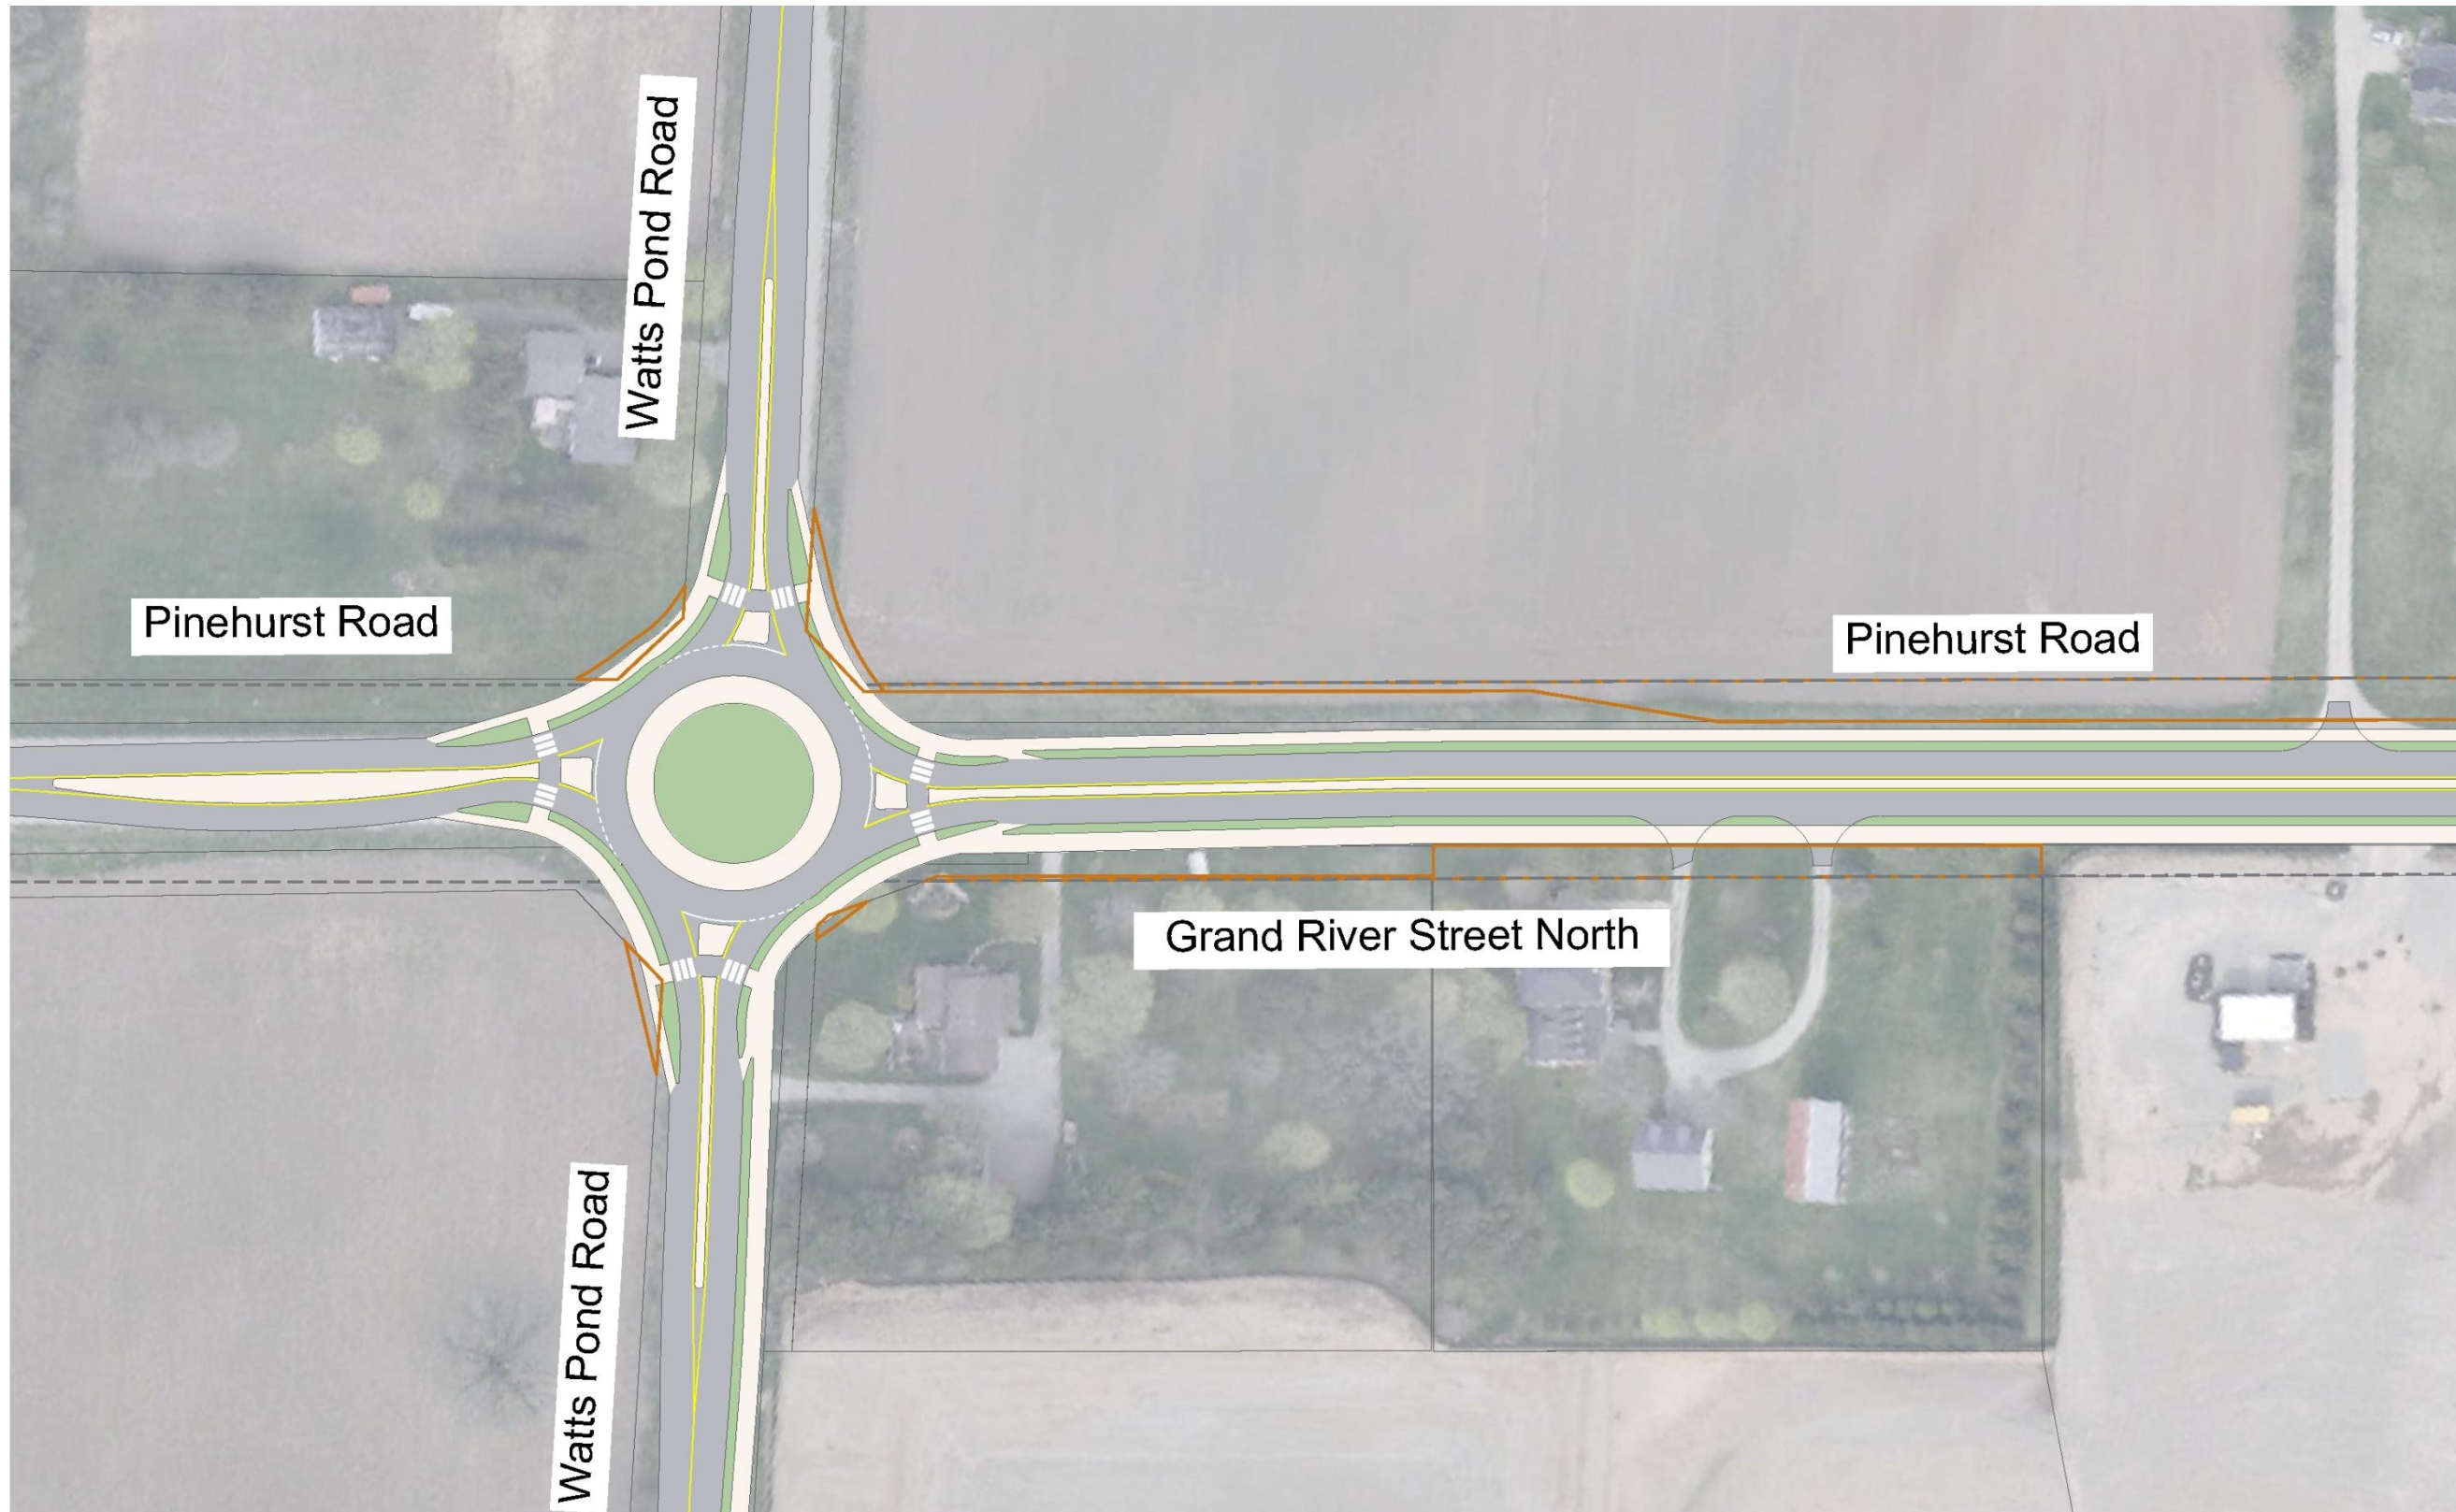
TPA Grand River Street North at Watts Pond Road Intersection
